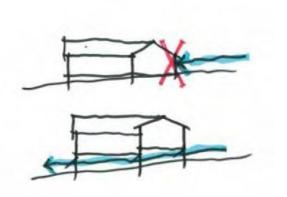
Graphic illustrating elevation of structure with soft story breakouts.
